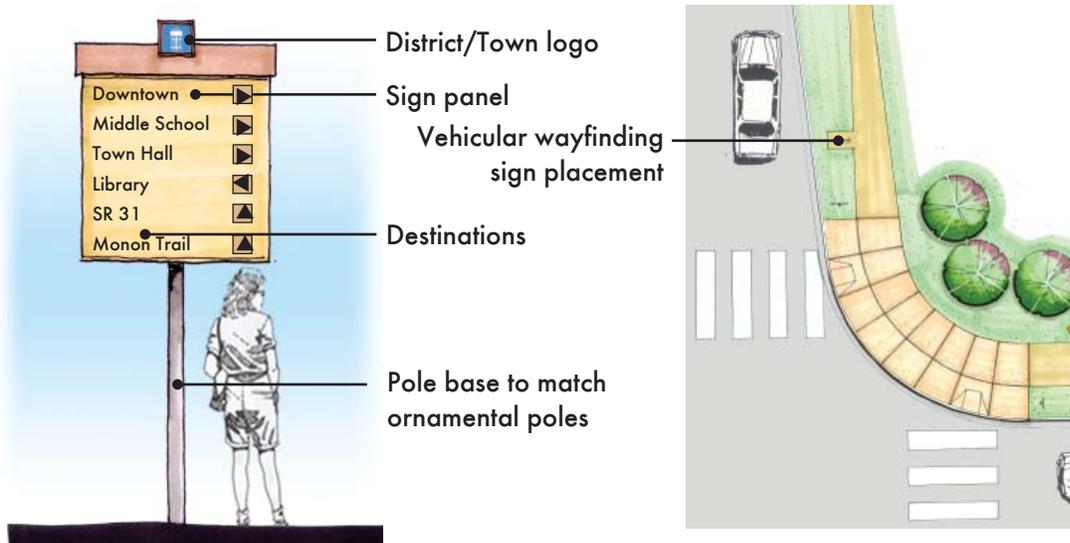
Elevation and typical plan illustrating vehicular wayfinding signage and typical placement.
